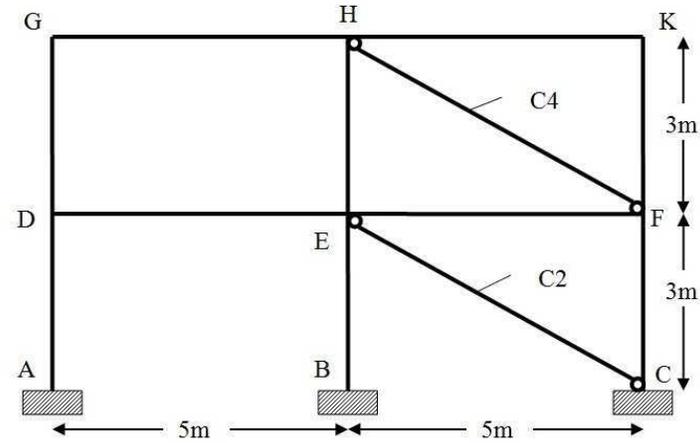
The RC frame F1 with diagonal cable-strengthening
